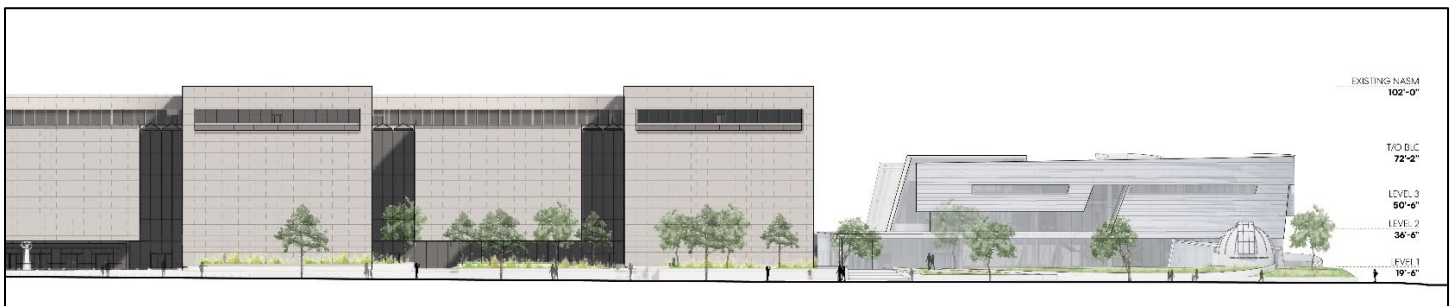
Proposed south elevation of the addition. Note the main mass of the new construction set back, and leaning away from the NASM, to allow the east elevation to remain visible and create a visual separation between the museum and the BLC. (Perkins&Will, 2024)
